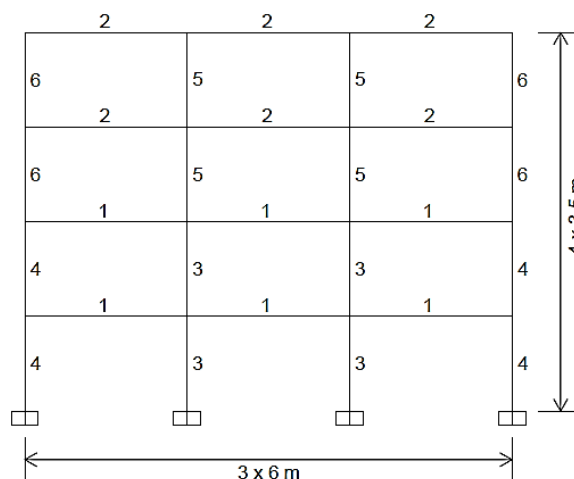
28-member planar OMRSF and grouping of structural elements
